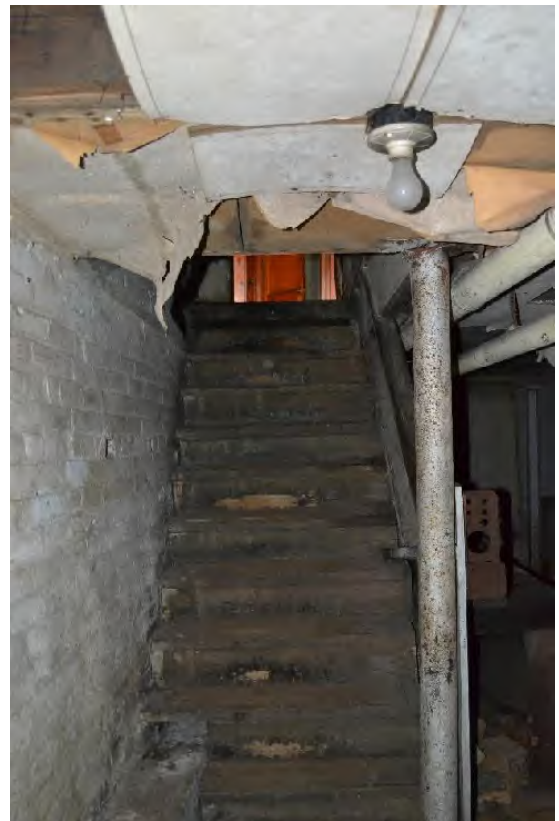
East basement, looking north, stairs to first floor dining room / east storefront. At left is the central load-bearing wall separating the east and west storefronts.
